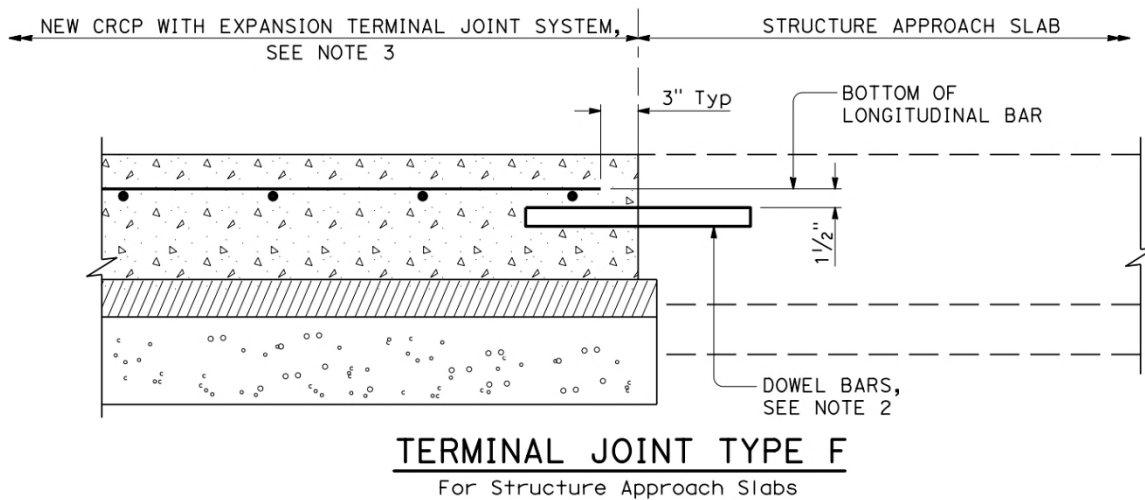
Example of Smooth Dowel Bars Placement Requirement
